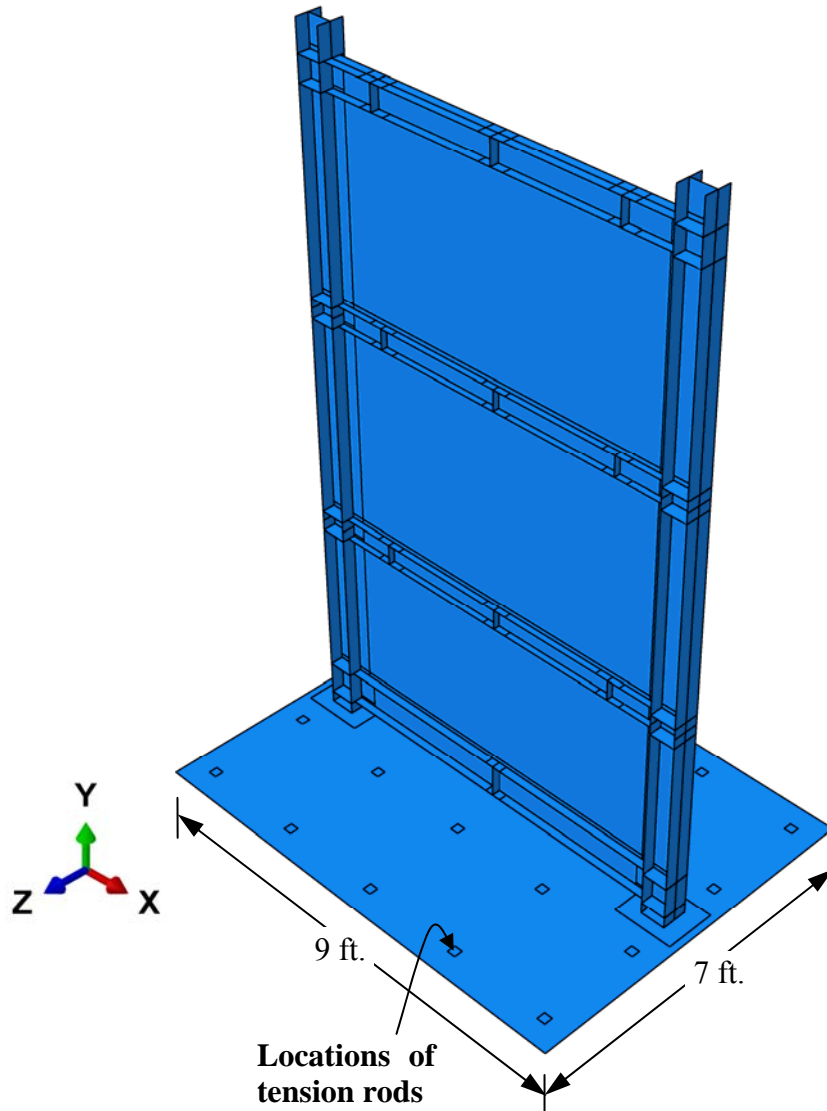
Finite Element Model of the 3-Story SPSW Specimen with Floor Plate
